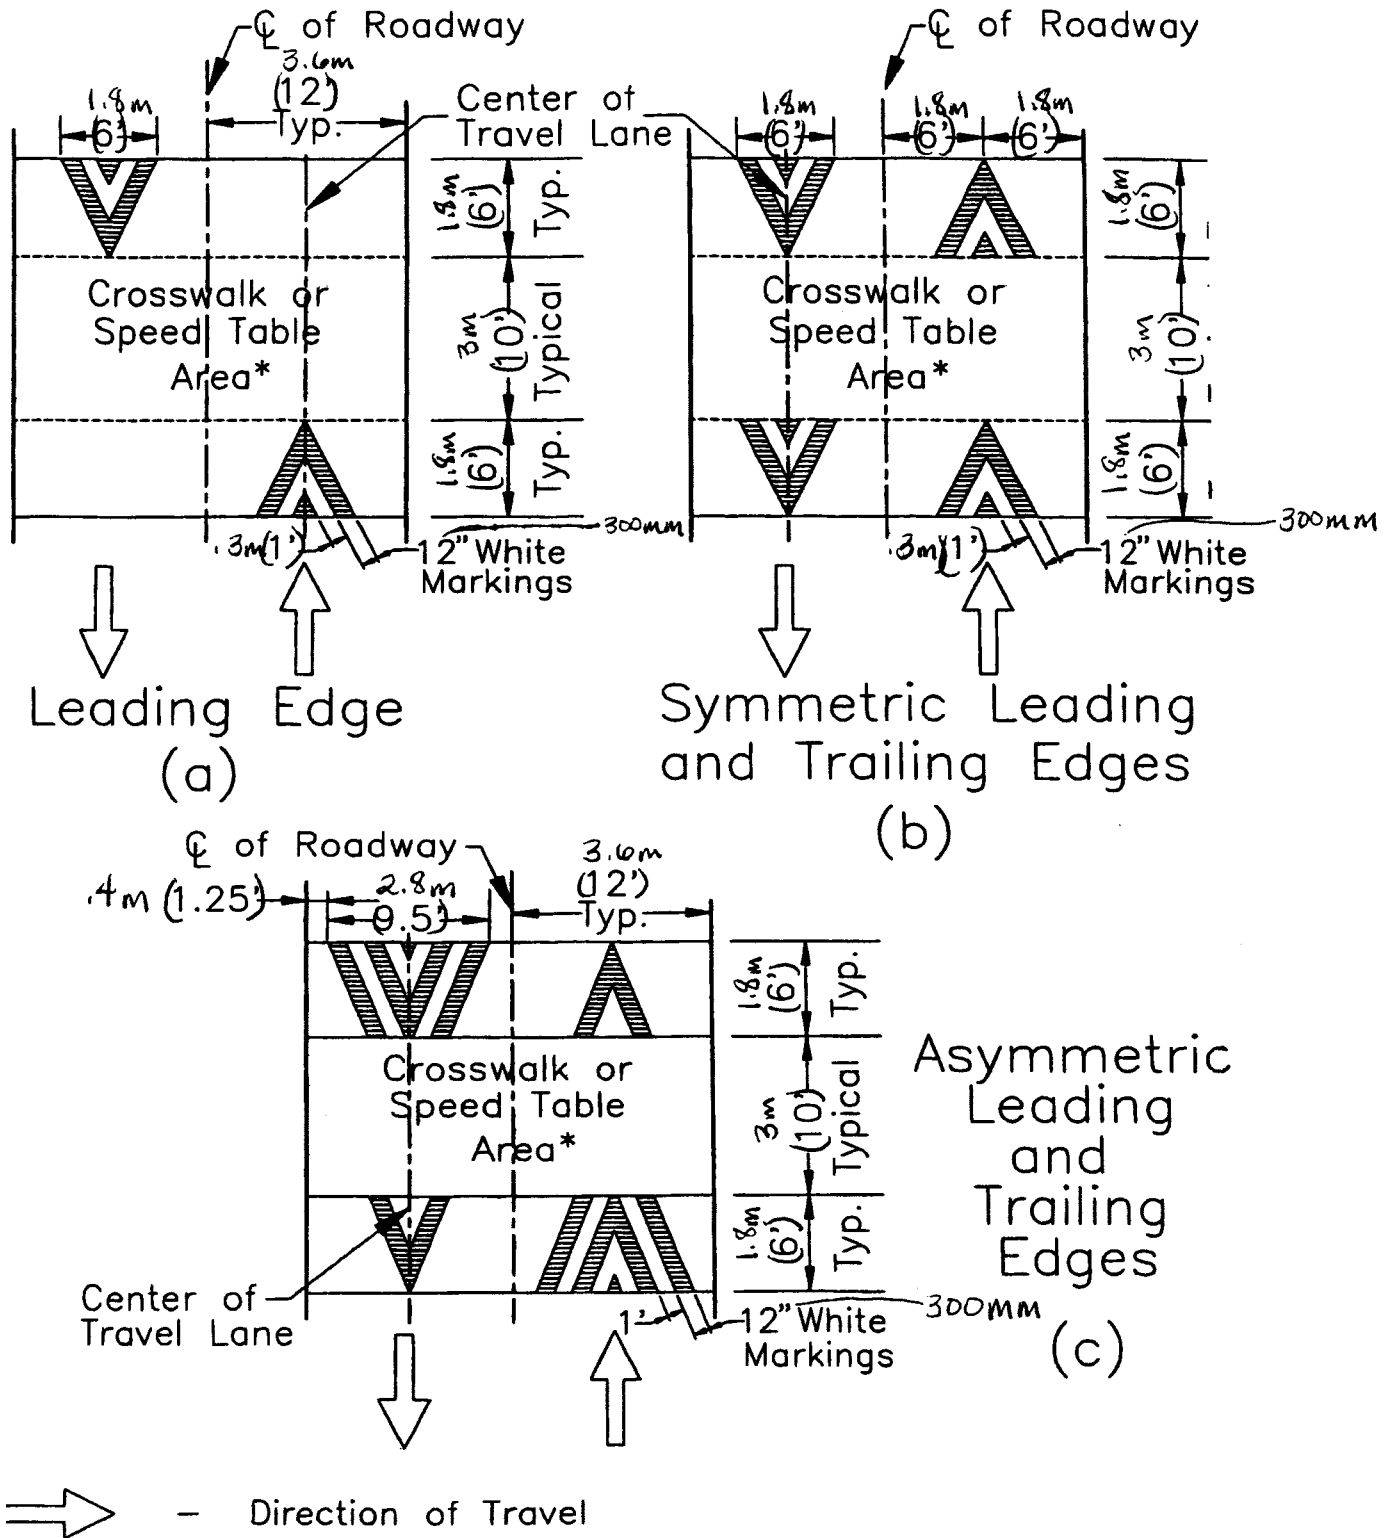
Pavement Markings for Speed Humps with Crosswalks
